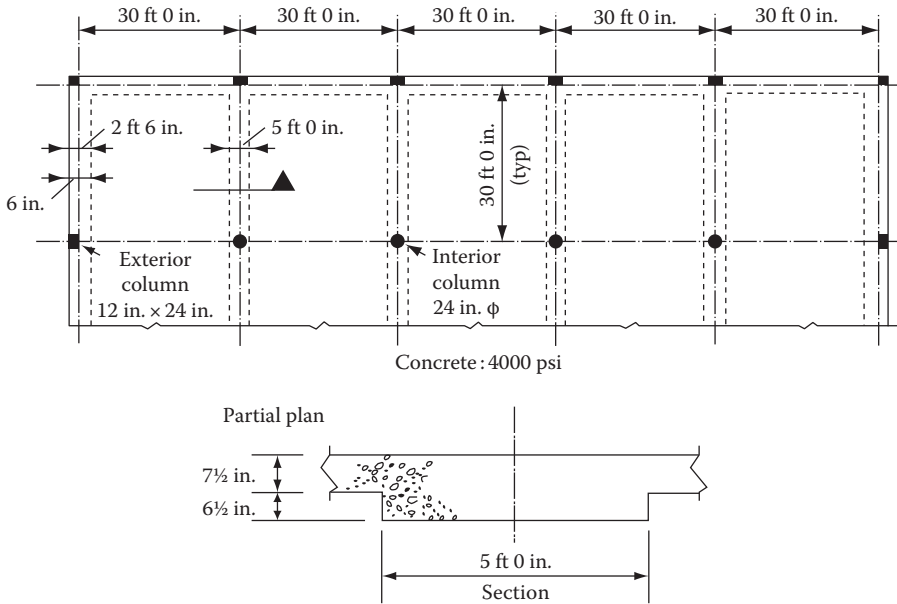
Example 1: one-way post-tensioned slab.
